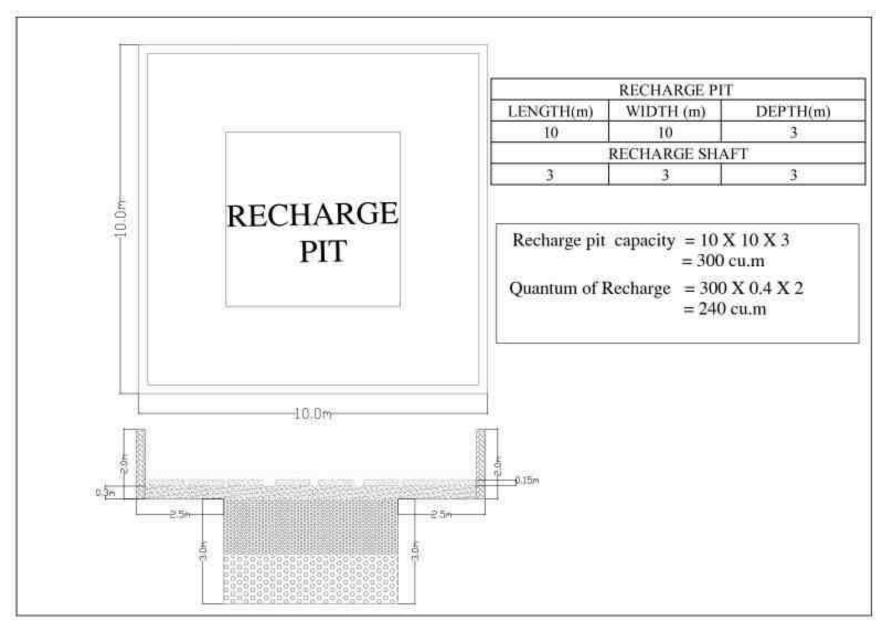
Recommended recharge pit dimension and cross section view of the recharge structures 363
